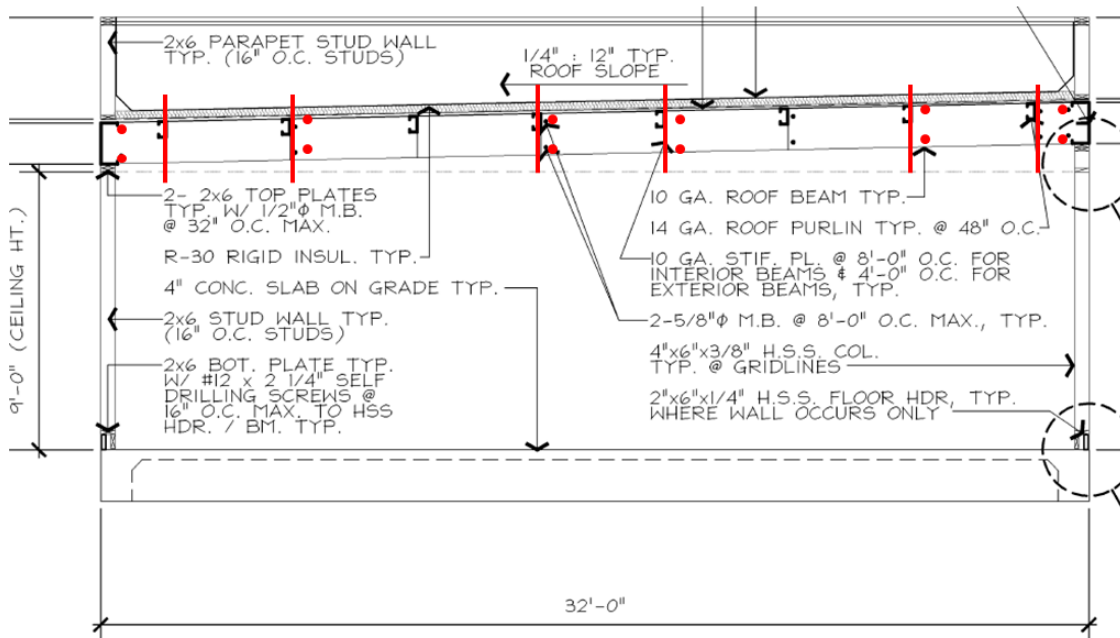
Bolt and Stiffener Plate Locations for 10x32 Modules
